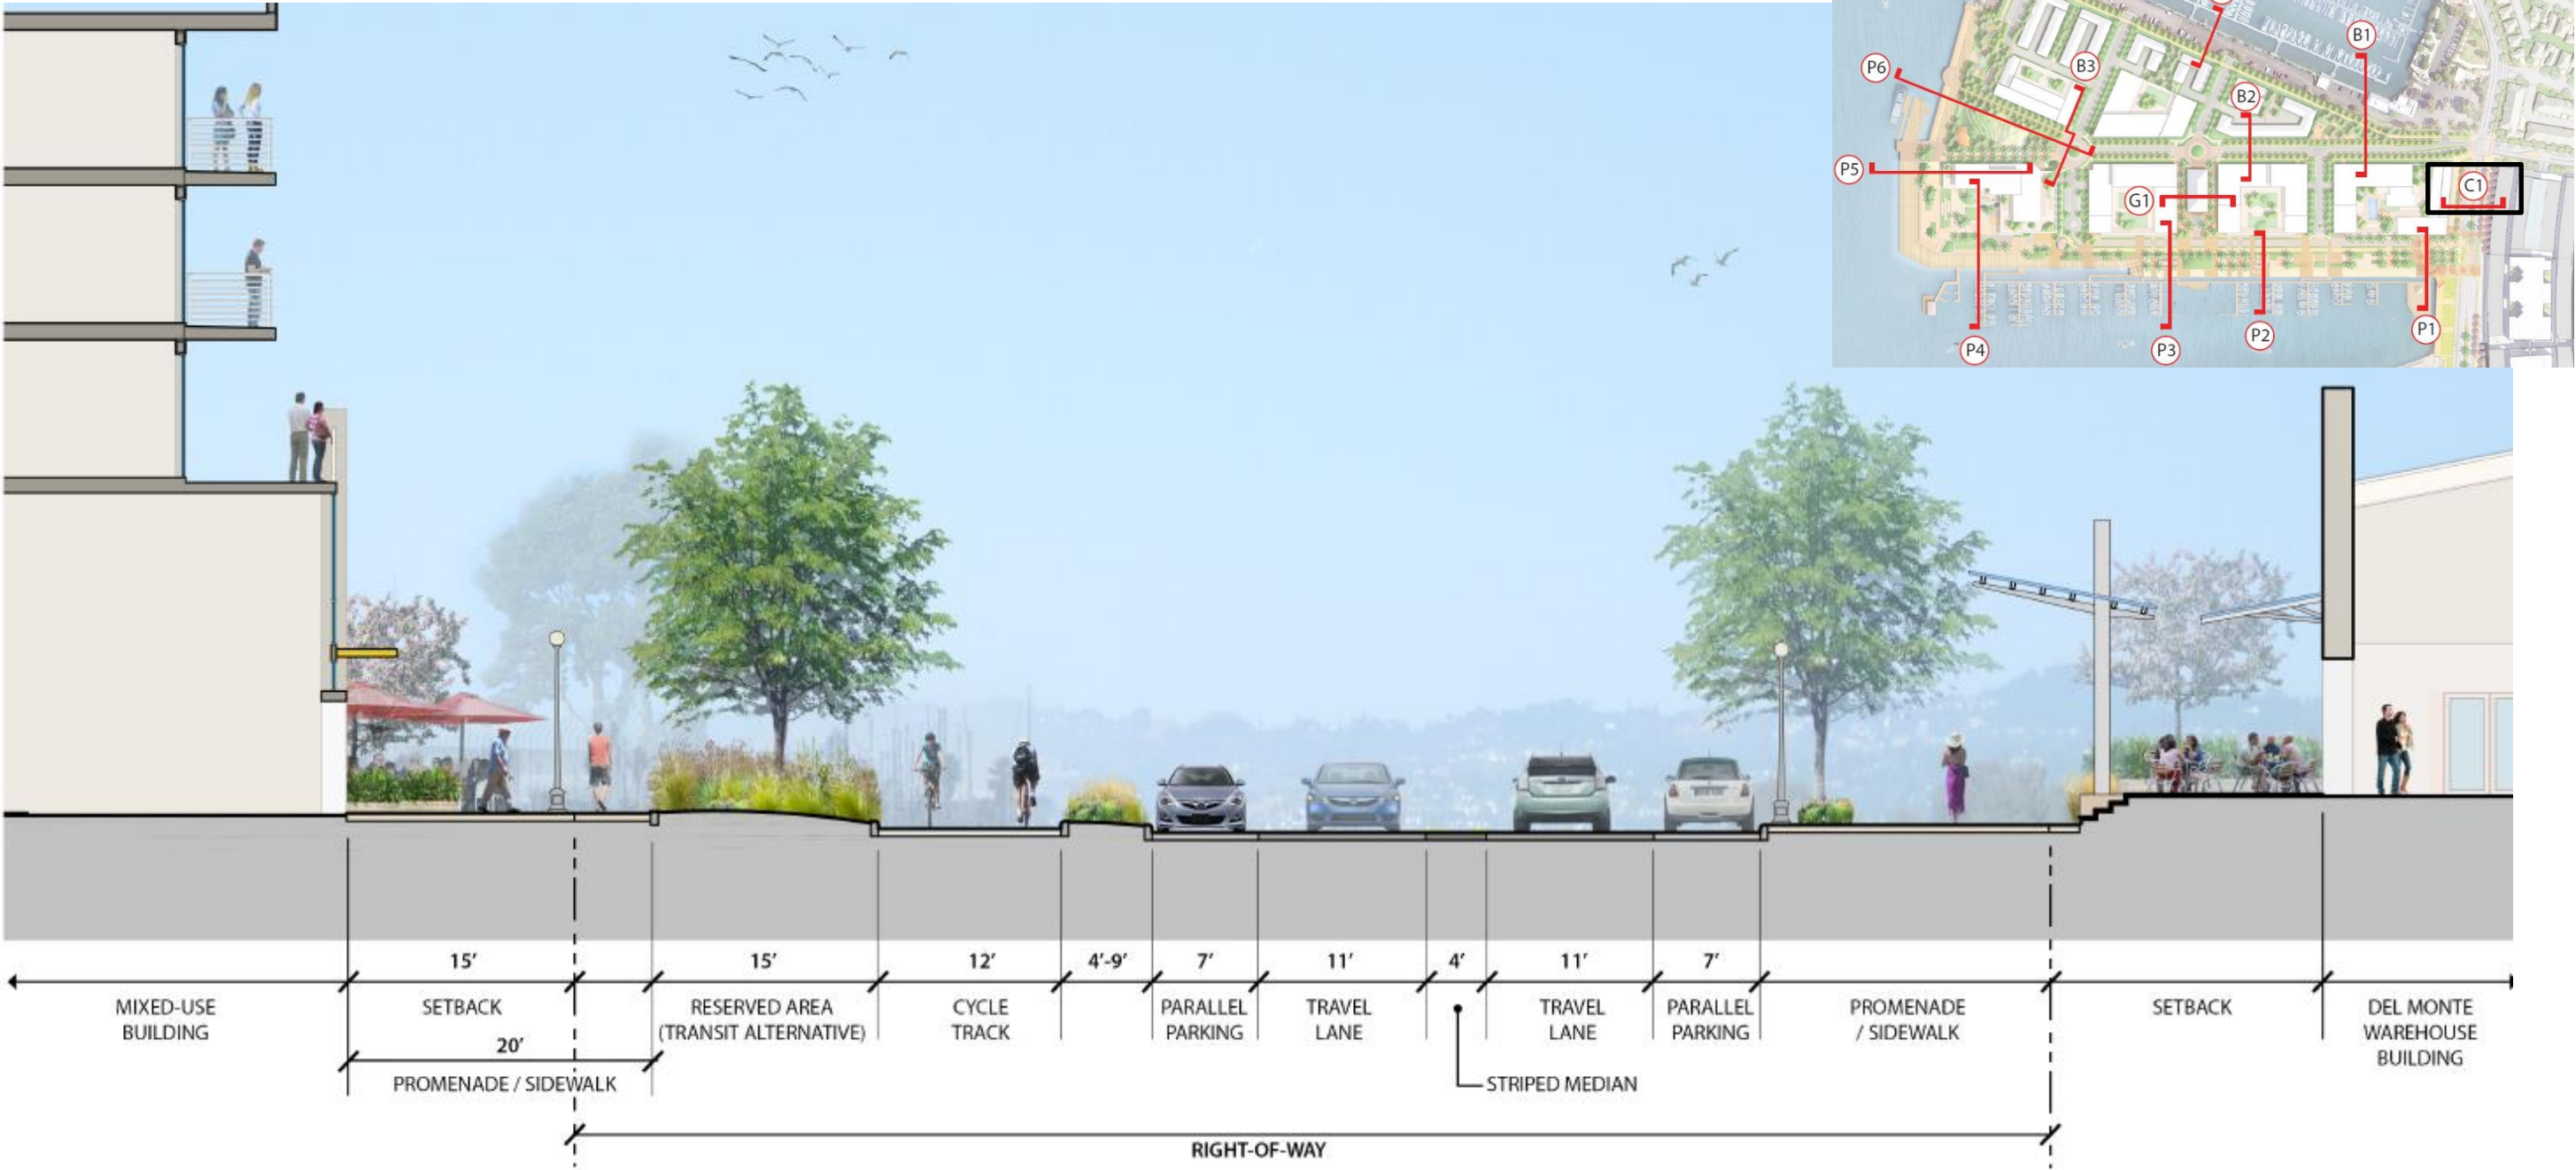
ILLUSTRATIVE CROSS SECTION P1: WATERFRONT PLAZA AND PROMENADE AT CLEMENT AVENUE (VIEW LOOKING NORTH)
